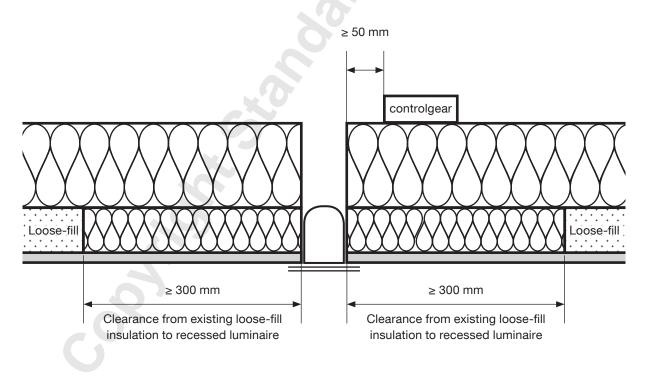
Installing ceiling insulation around recessed luminaires of the type CA 80, CA 90, and CA 135 where the luminaire manufacturer's instructions are not known (ceilings with existing loose-fill insulation)
